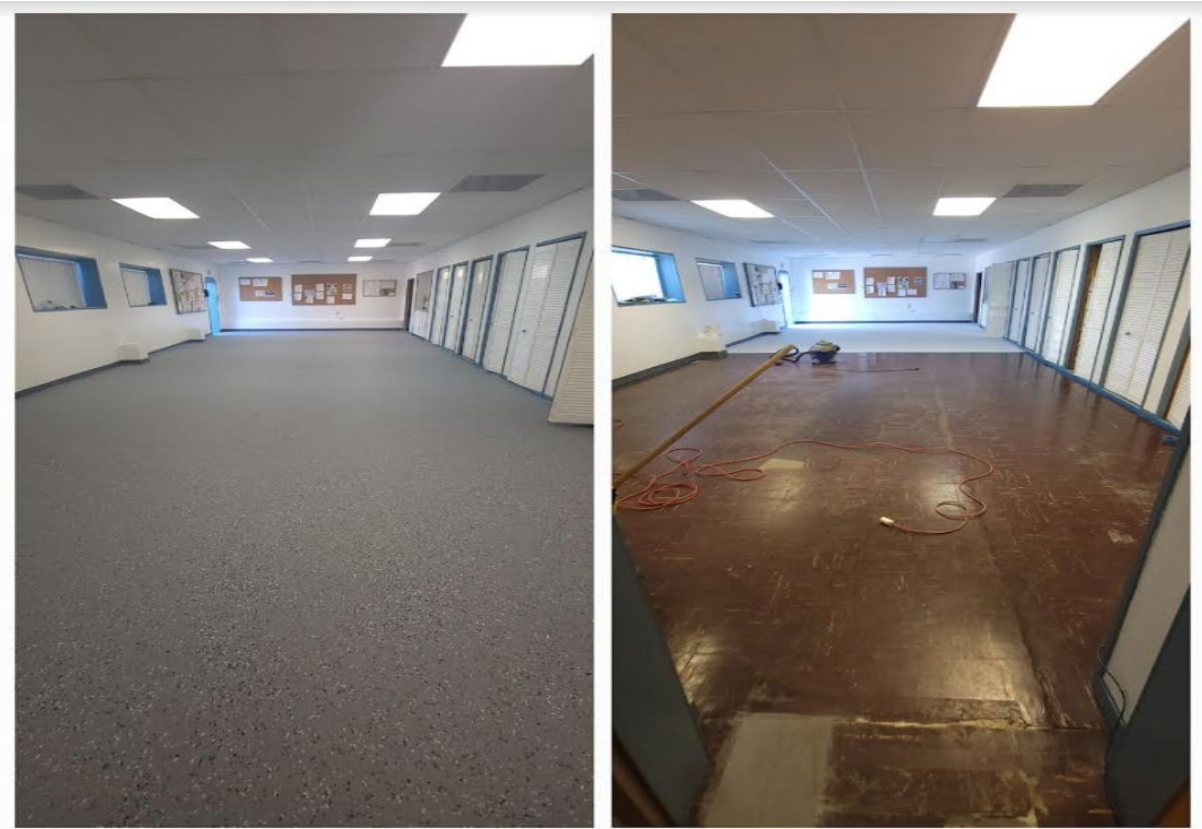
The Quonset before and after image of the renovated floor epoxy (Left side of the image is the updated floor epoxy).
